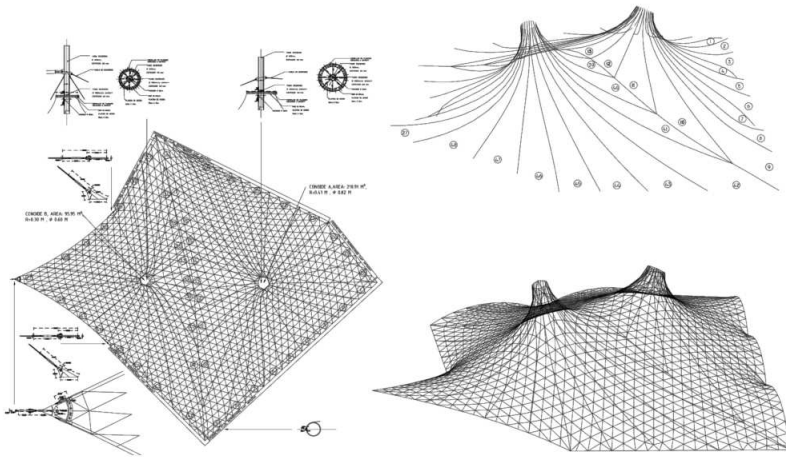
Drawings: Plan, perspective, pattern layout, details
